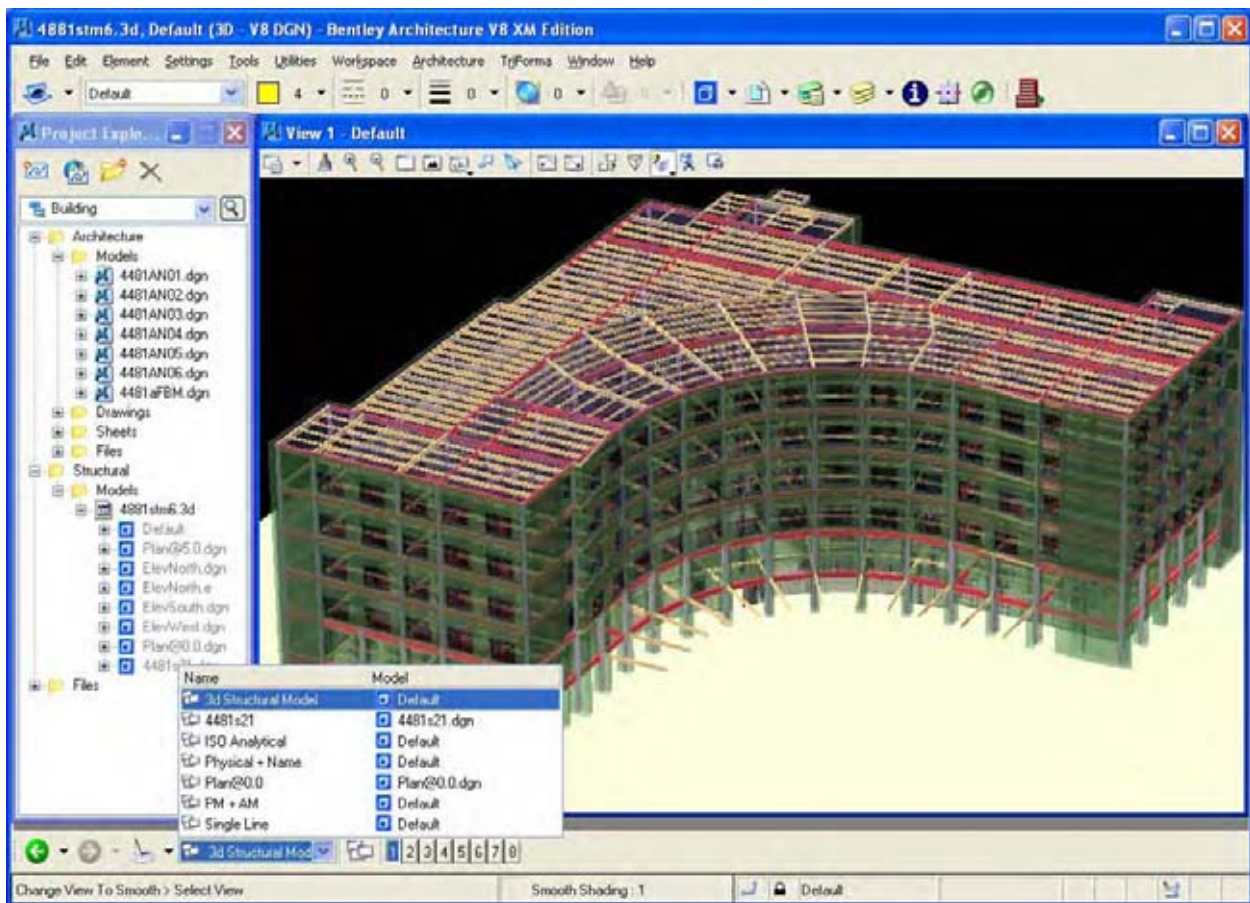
Viewing the structural model of a building, created using Bentley's structural BIM application, within Bentley Architecture.
